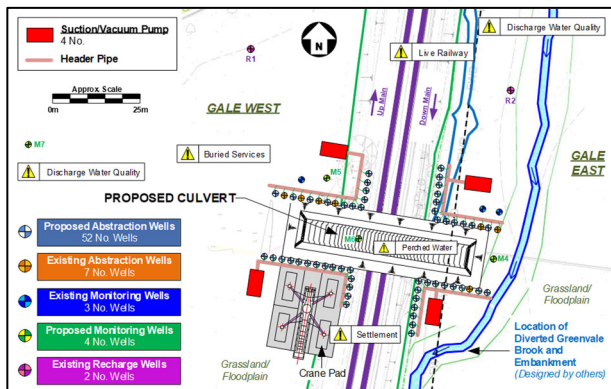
Site plan showing well locations and dewatering system pumping set up at the site.
